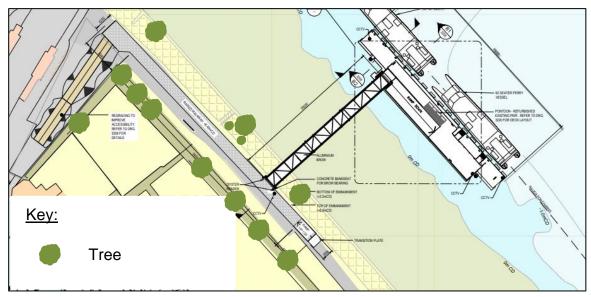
Proposed Plan for Temporary Barnes Pier with approximate tree locations
